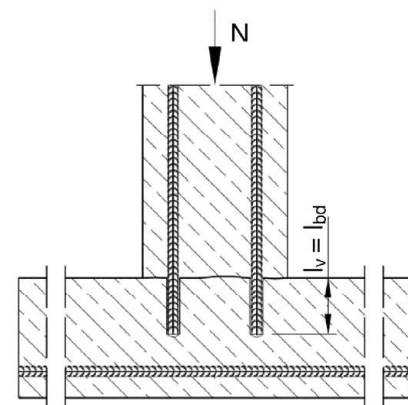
Anchoring of reinforcement to cover the line of acting tensile force
